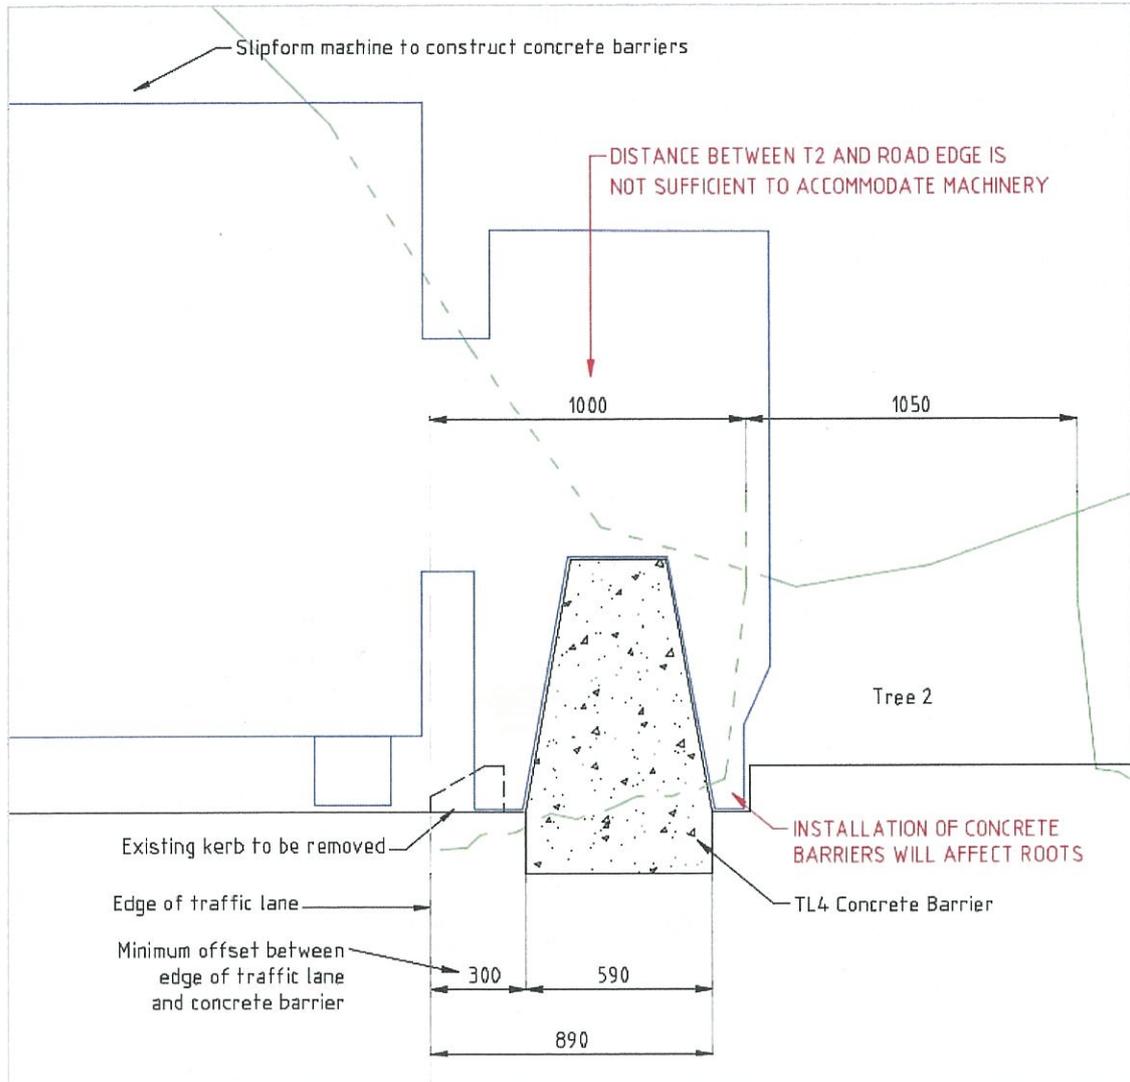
Concrete barrier option construction limitations (Tree 2 as an example)
